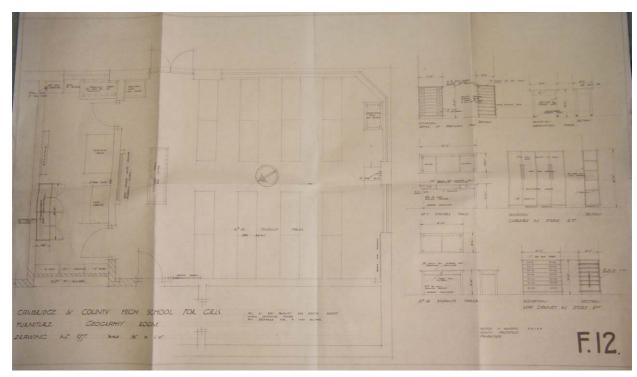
Plan Showing Design of Geography Room (W.H. Wingage)
